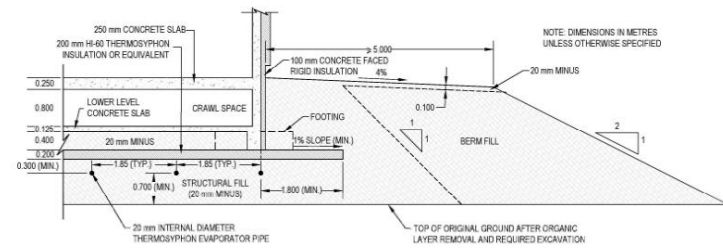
Recommended design section for a thermosyphon-stabilized building foundation
